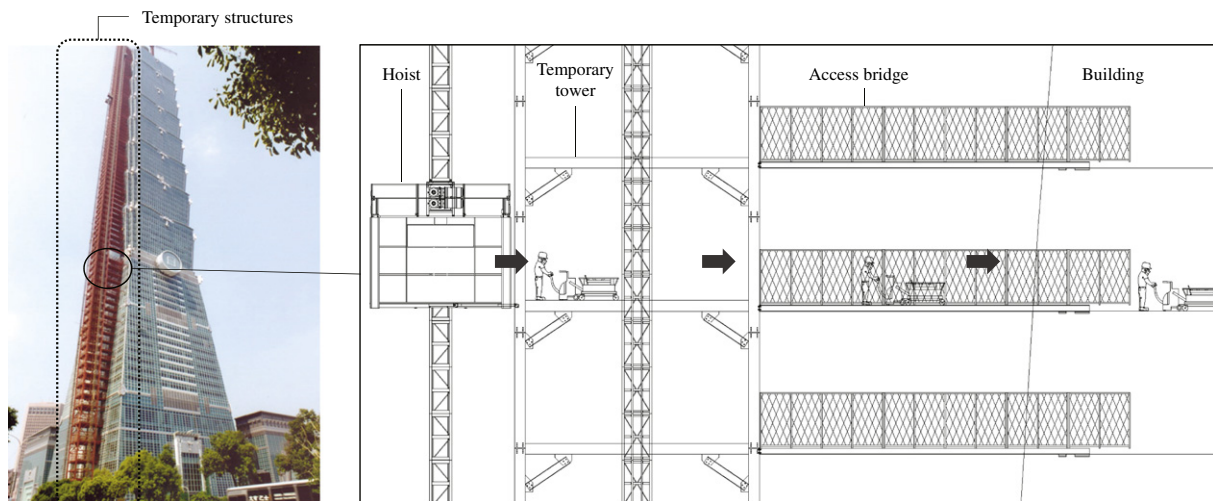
Temporary structures for the access into the building on Taipei 101 tower construction.
